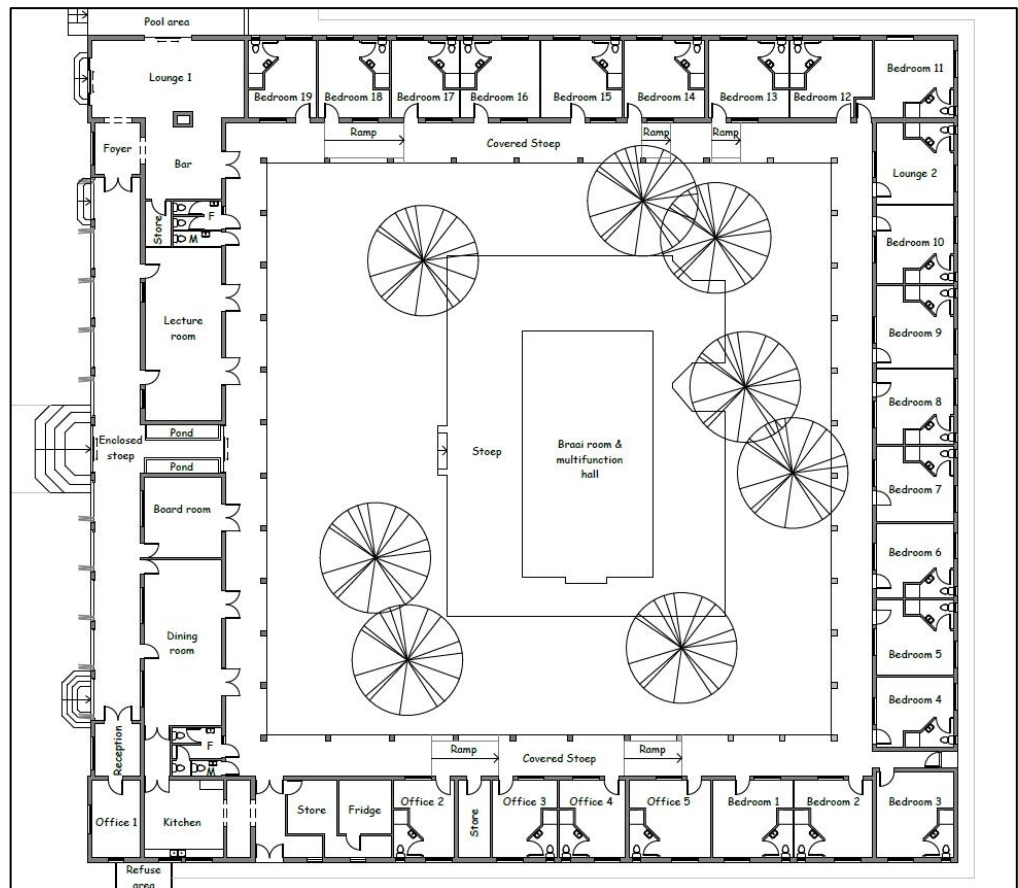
Proposed Uses in the Main Building potentially subject to some internal changes
